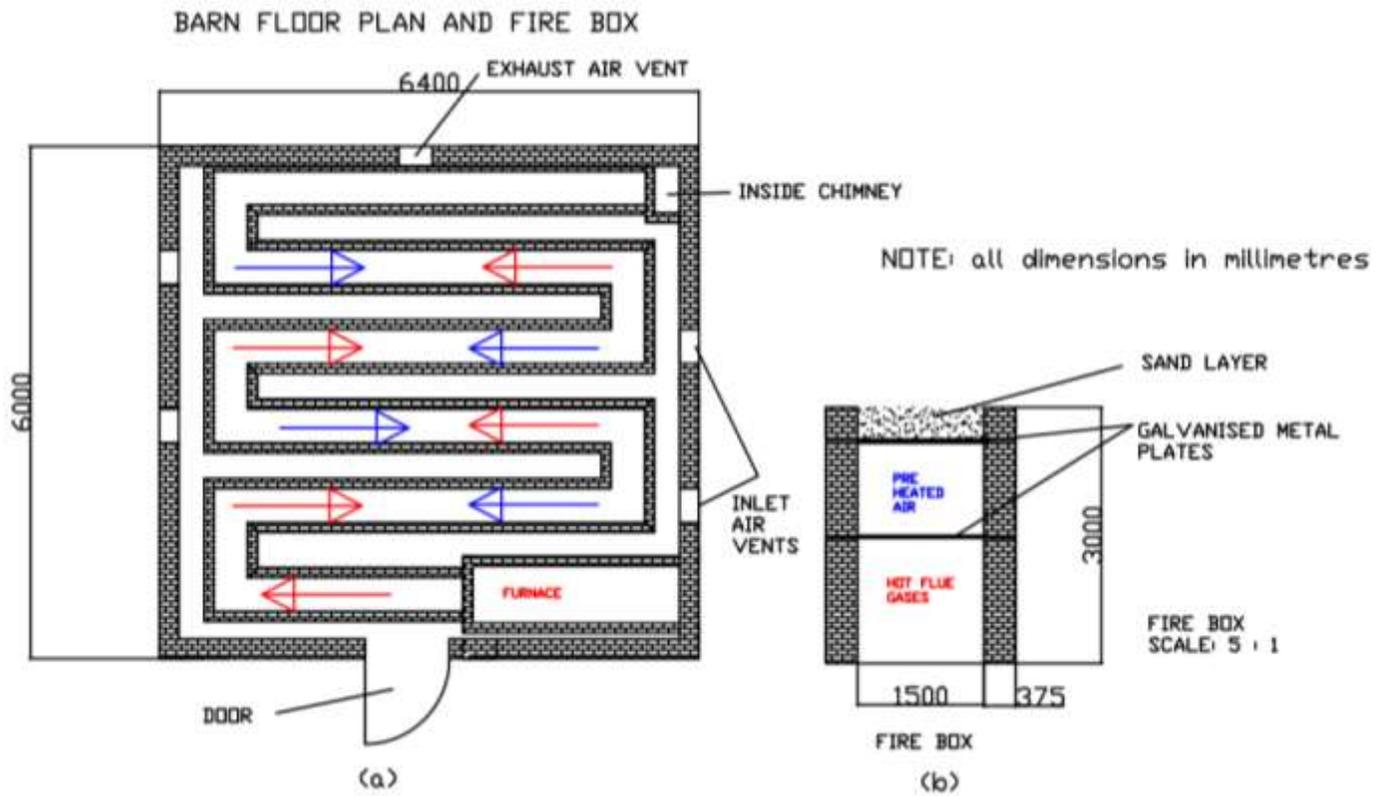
a) The KCC 1 barn plan and b) the KCC 1 firebox layout.
